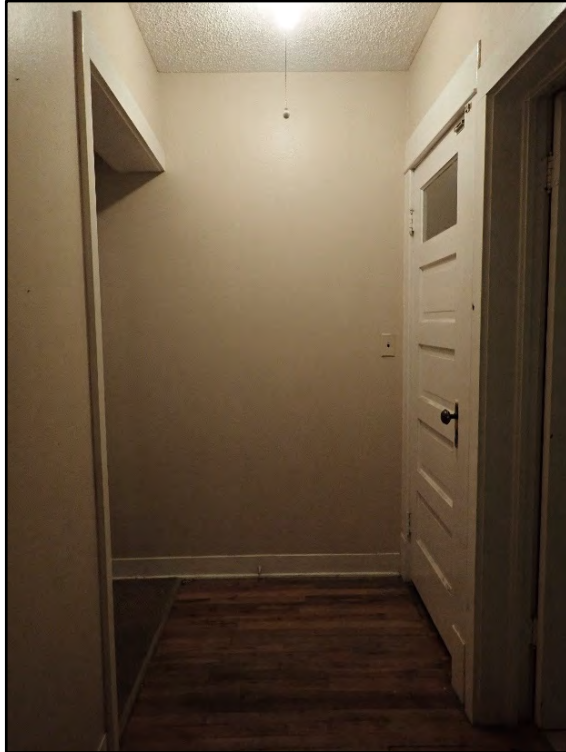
The original hardwood floors installed when this part of the house was constructed between 1910 and 1916.
